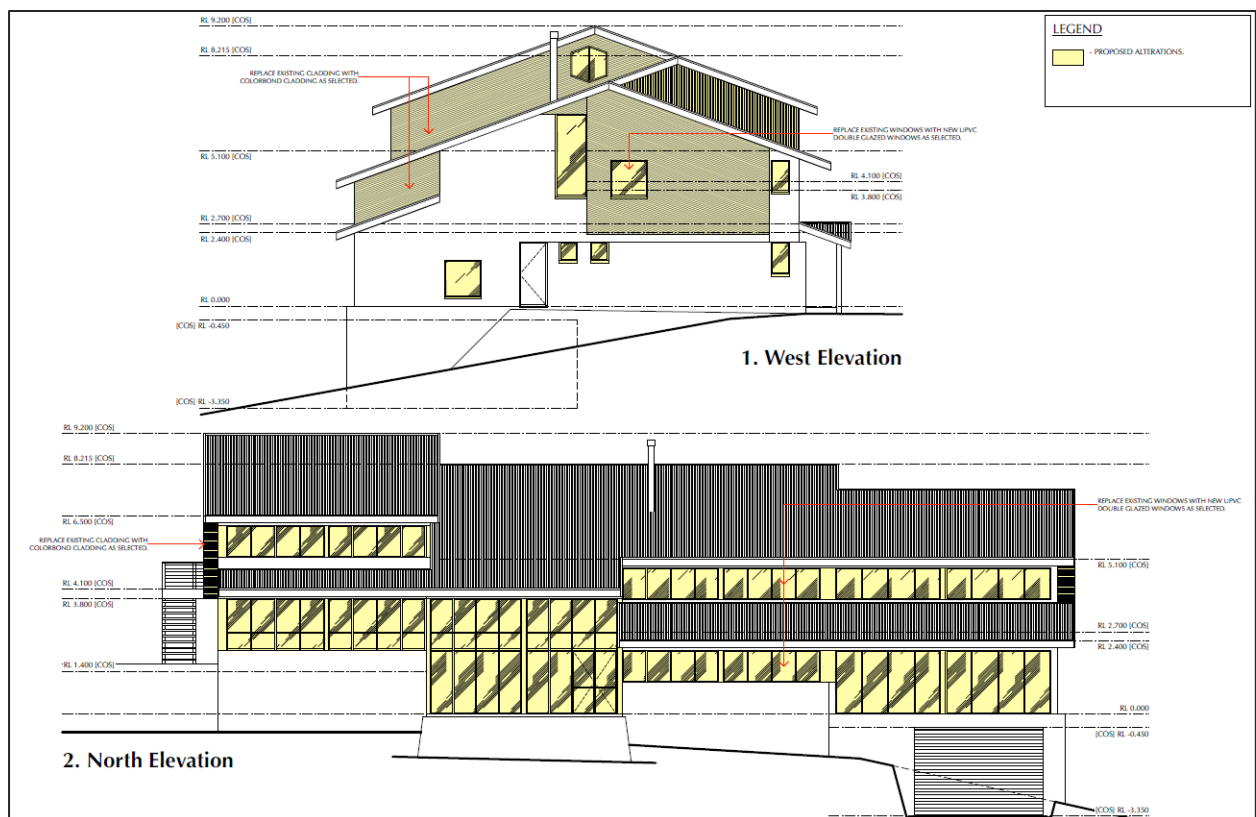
| Cladding and windows to be replaced on the West and North elevations (Source: Applicant's documentation)
